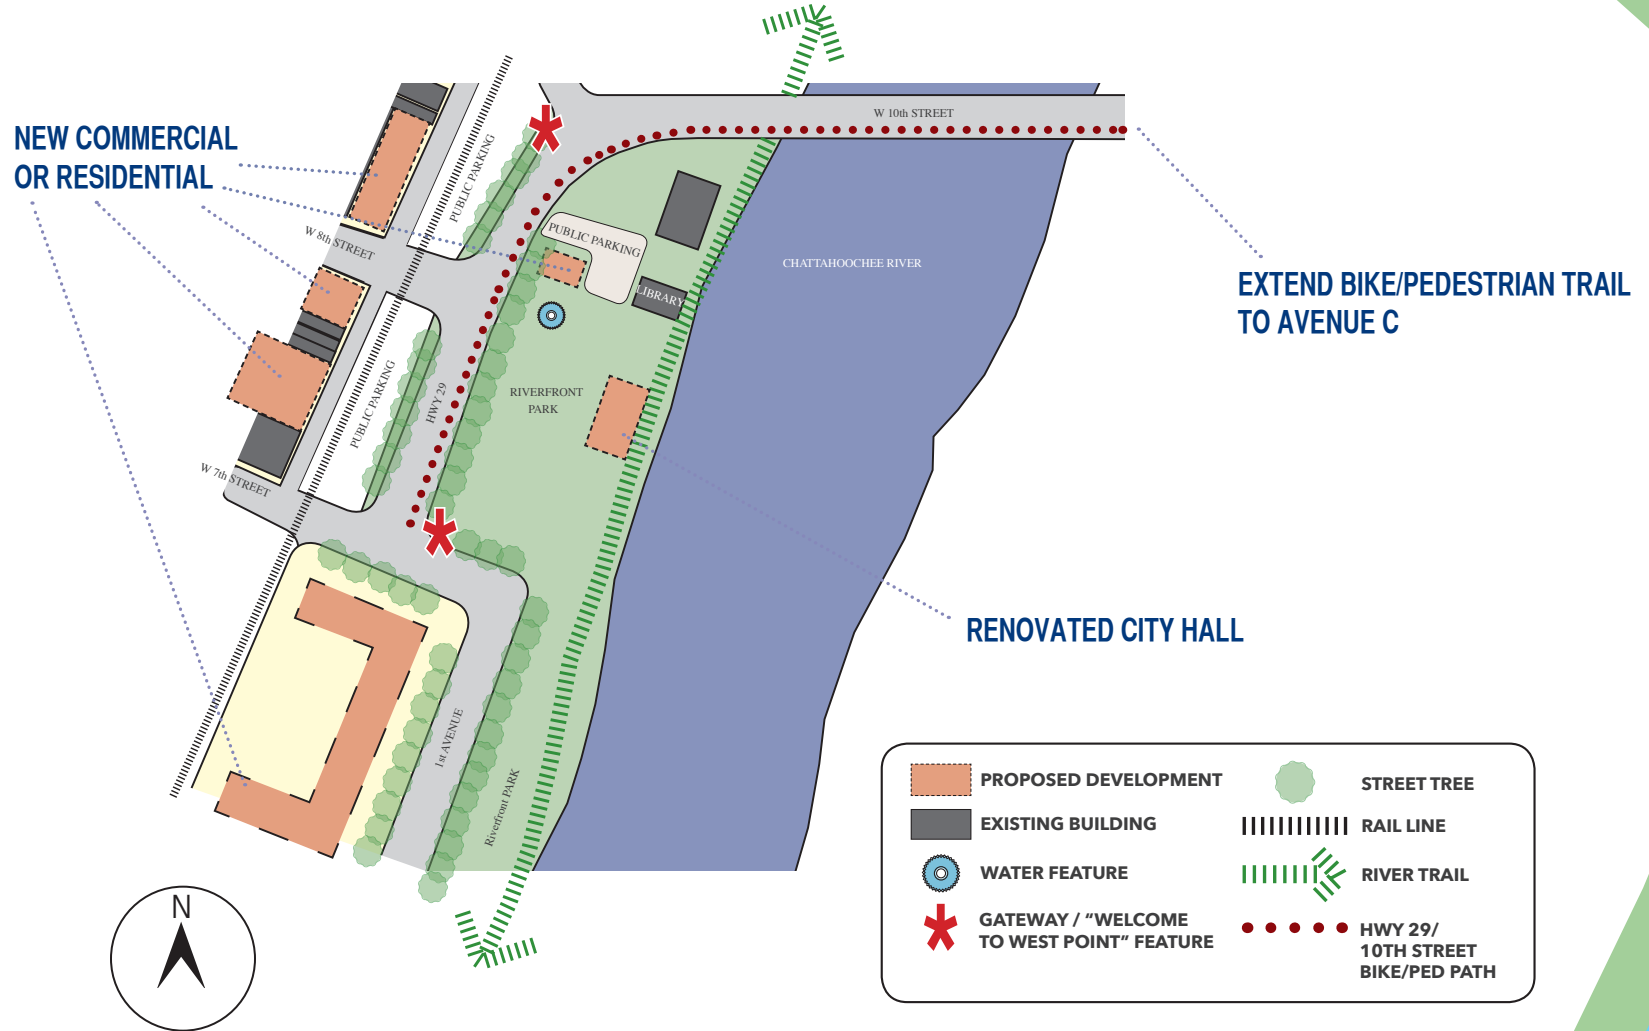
PROPOSED RIVERFRONT PARK PLAN
